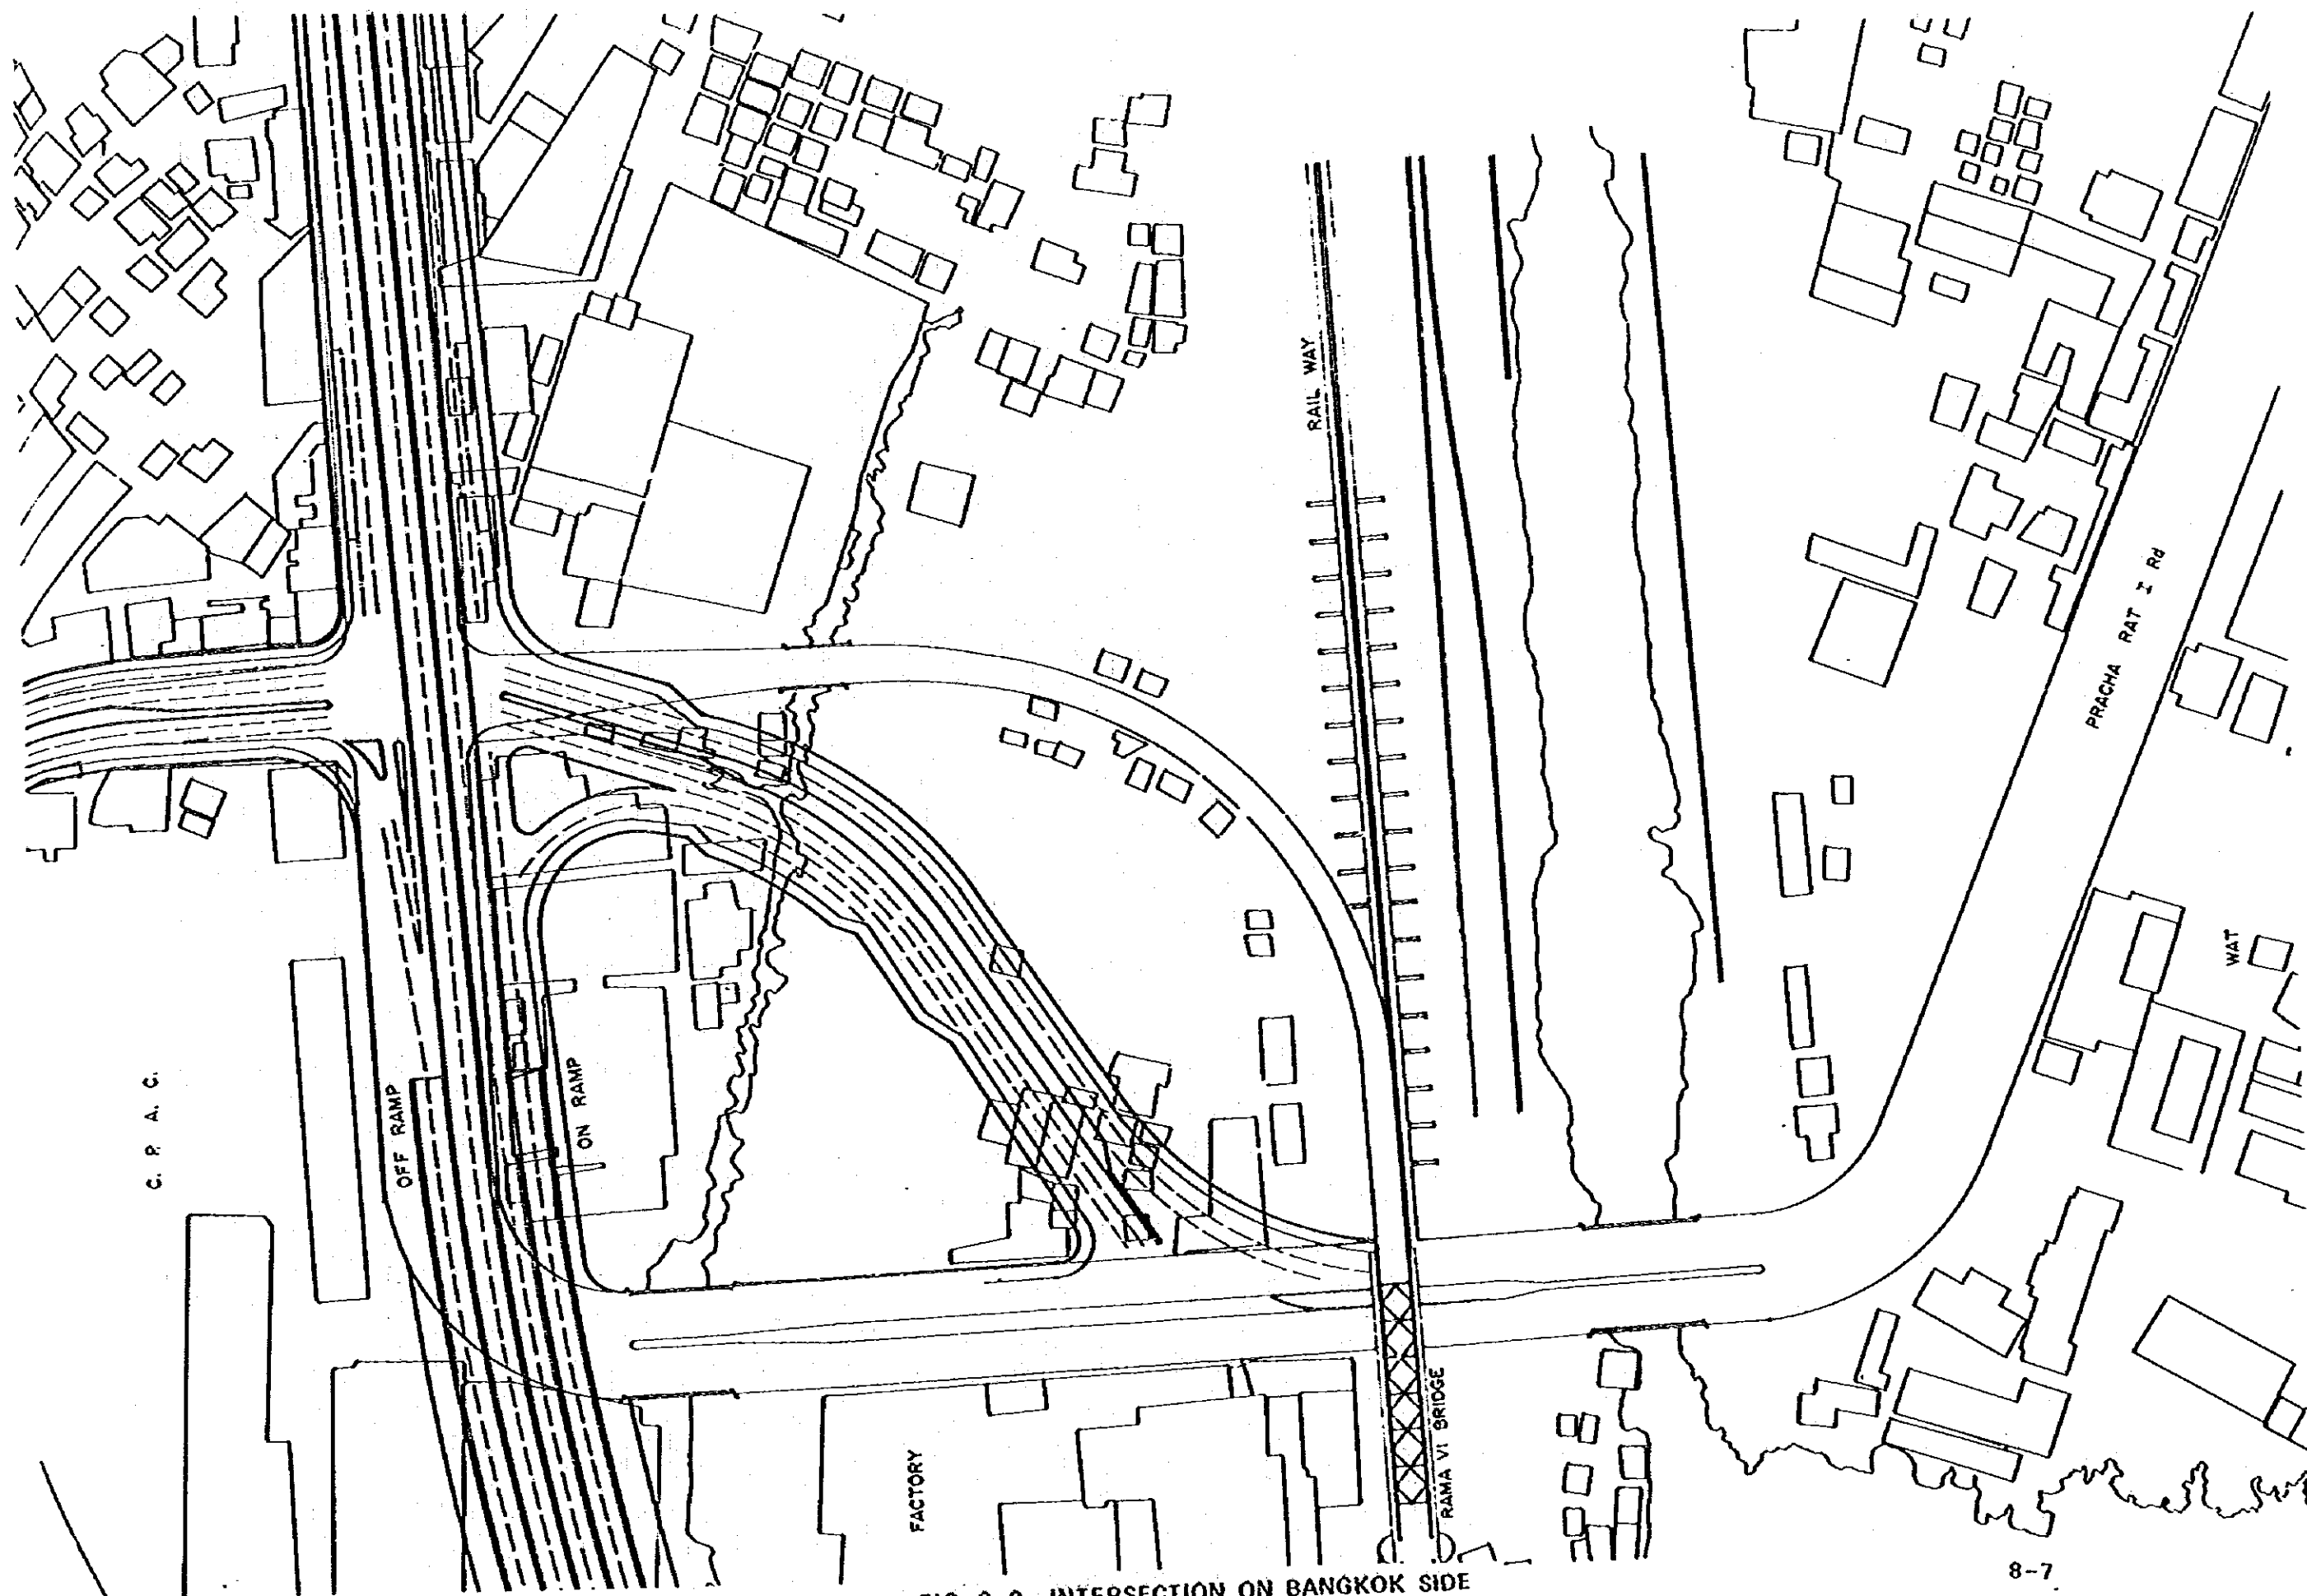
INTERSECTION ON BANGKOK SIDE
